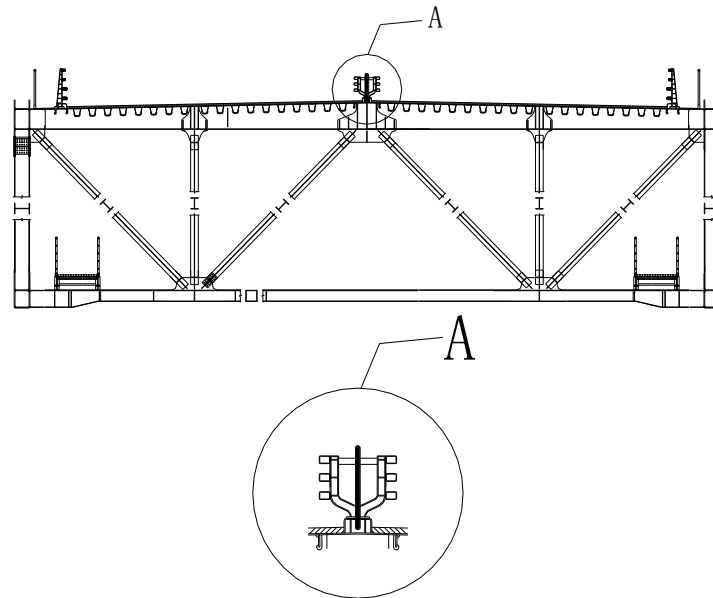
Center Stabilized Plate of Qingshui River Bridge
